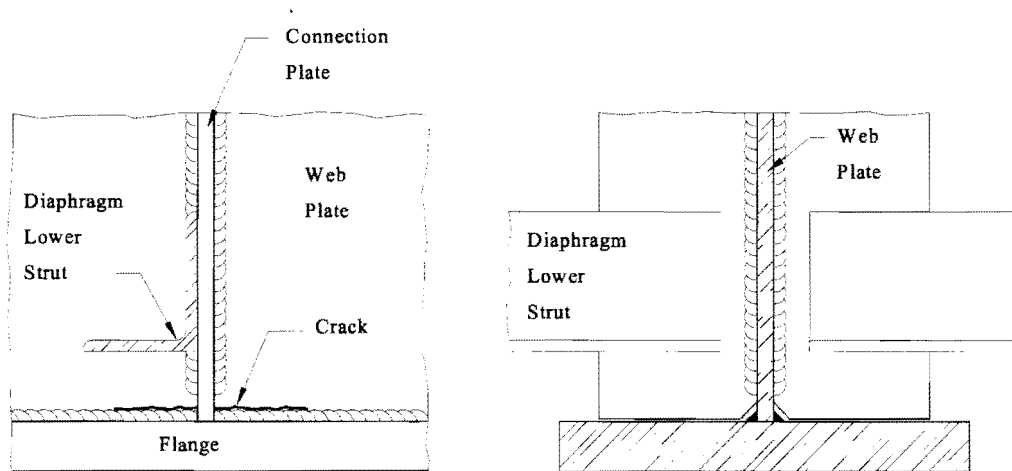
Fatigue cracking in tight-fit detail.
